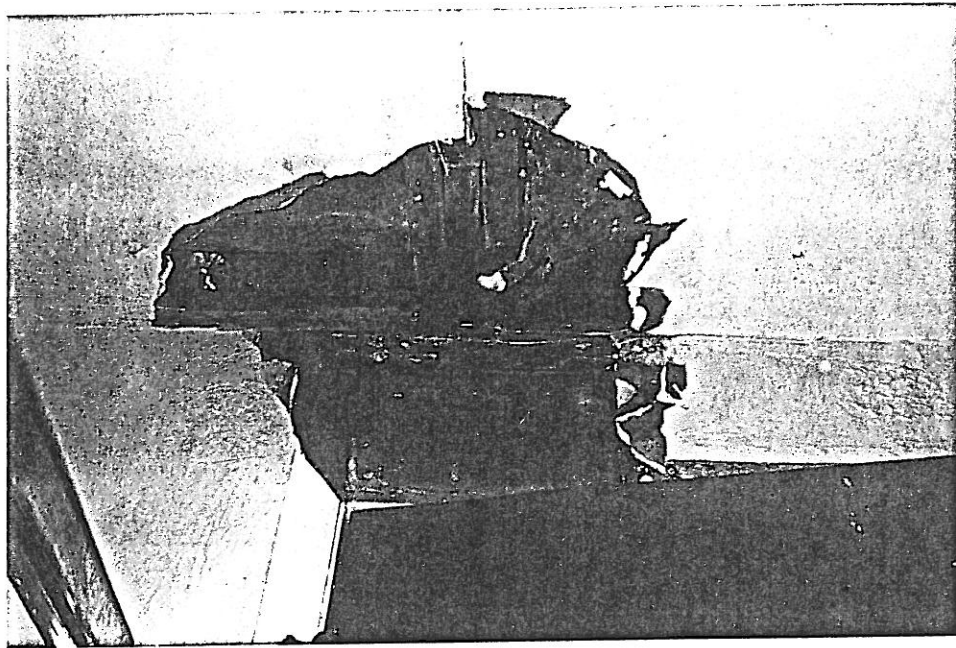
BASEMENT BATHROOM; THE EXISTING WATER DAMAGE AND ROTTING ON THE BATHROOM CEILING.
